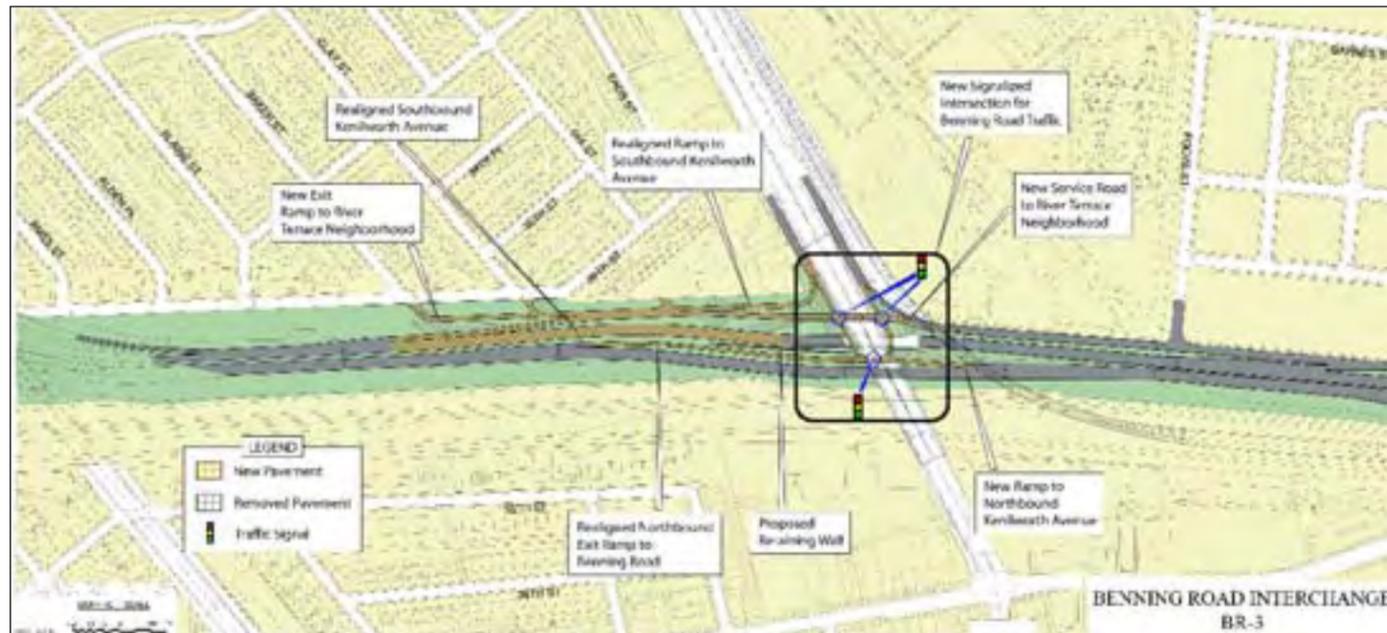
Scenario BR-3 (New center-leg ramp to the south of the Benning Road bridge)
